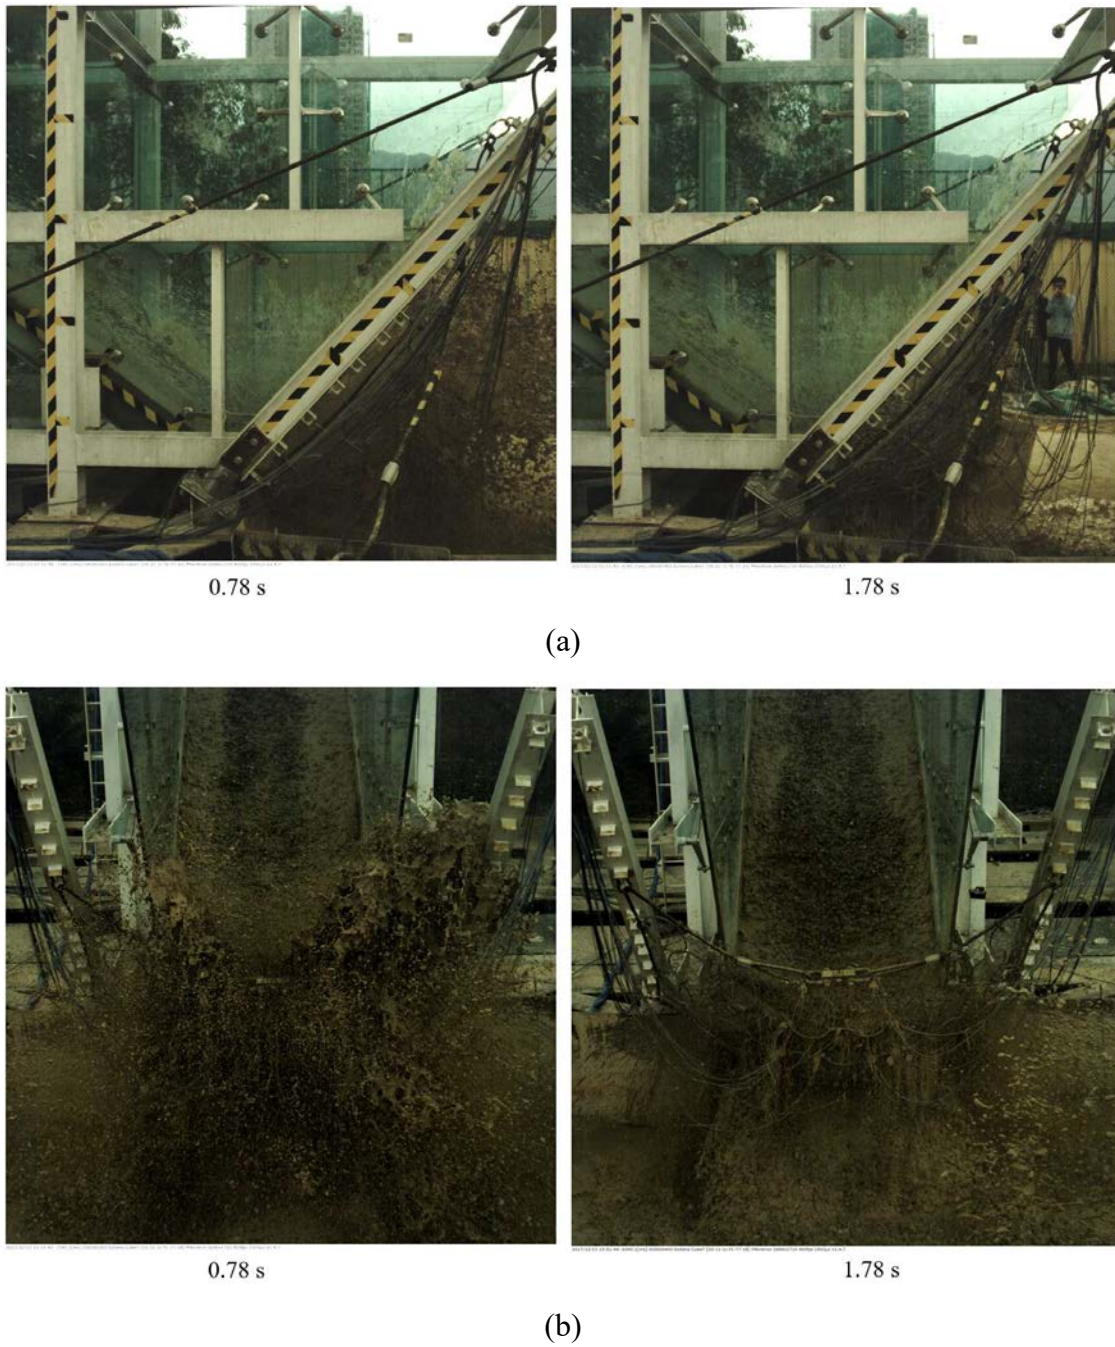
(a) Side-view and (b) front view photographs of the impact process in Debris Test 2 with IBR=0.44
